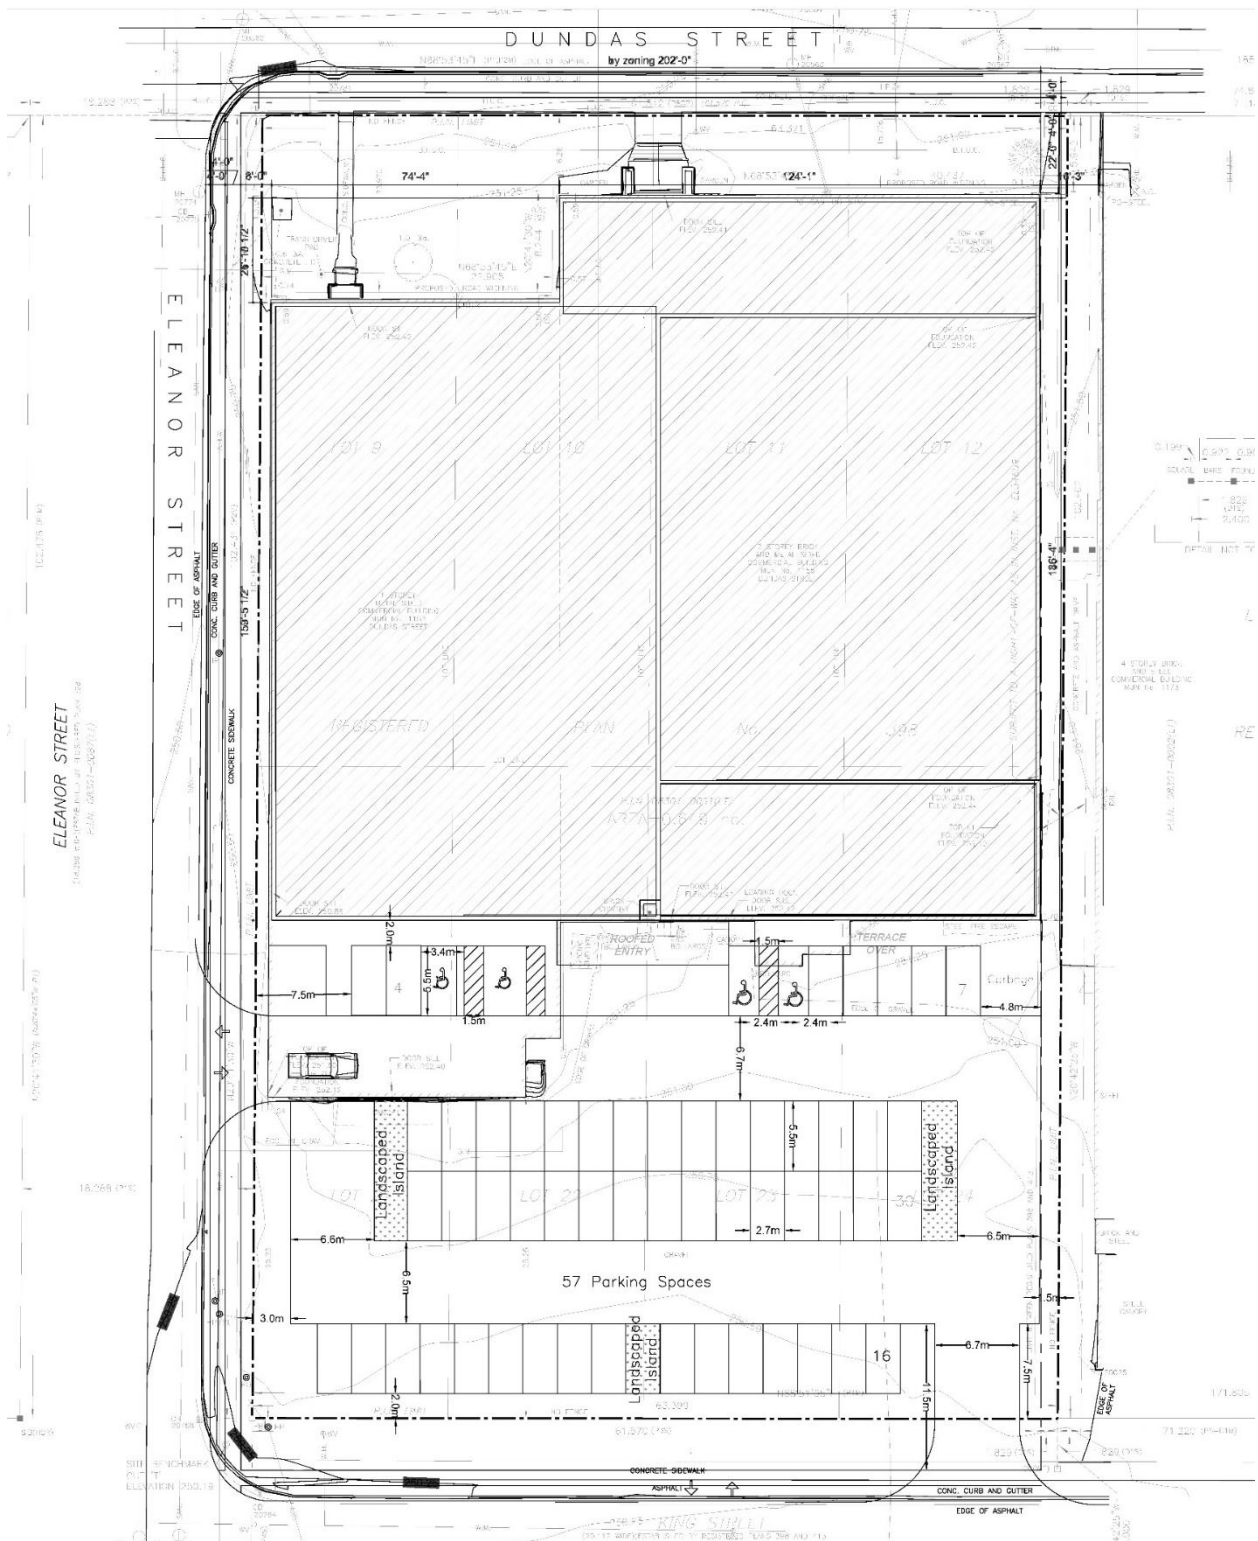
1153-1155 Dundas Street – Revised Conceptual Site Plan
